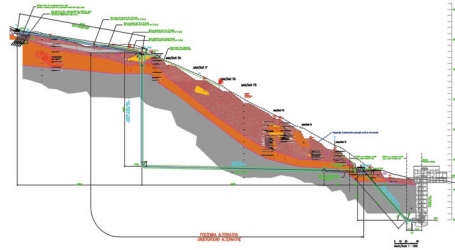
Profile of the underground penstock with a vertical pressure shaft (190m) and horizontal tunnel (385m).
